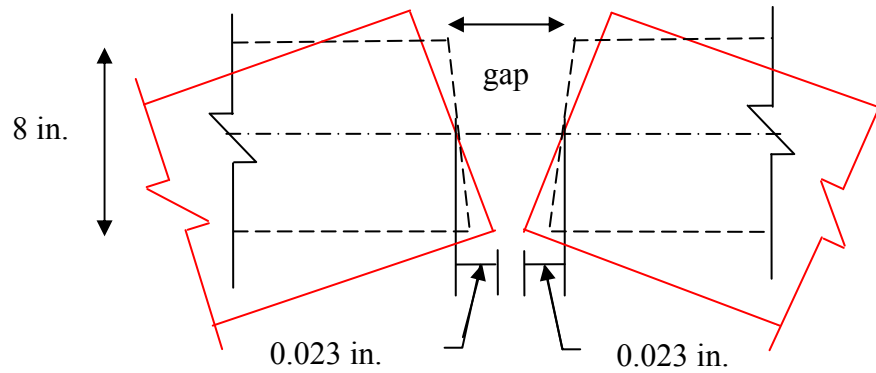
Restrained shrinkage cracked section
